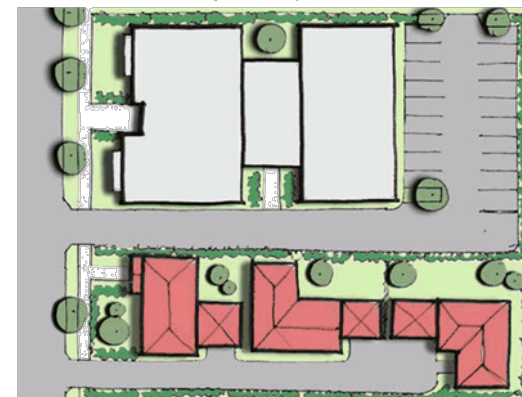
plan of preferred off street car parking locations in Precinct 7
